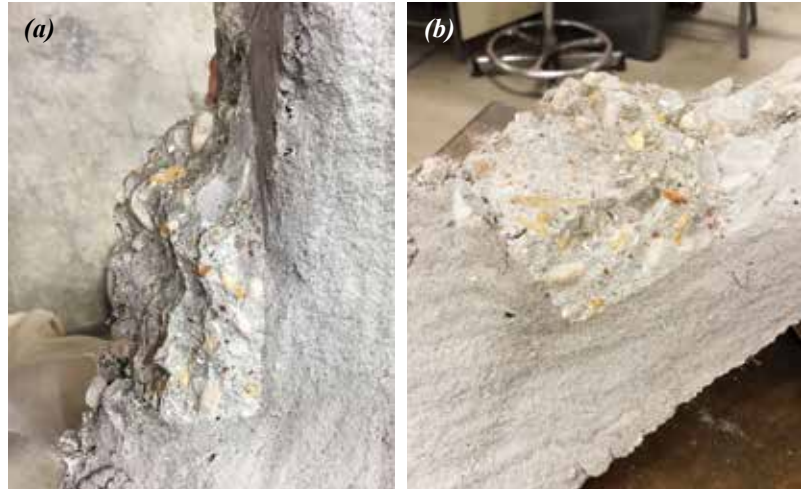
Bonding abilities of Tekcrete Fast to portland cement
